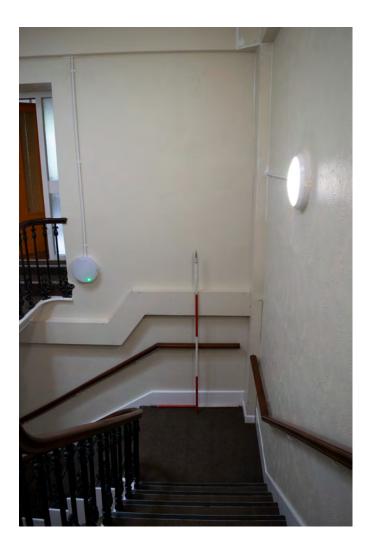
View looking down the staircase to ground floor. 2mx1m scale.
